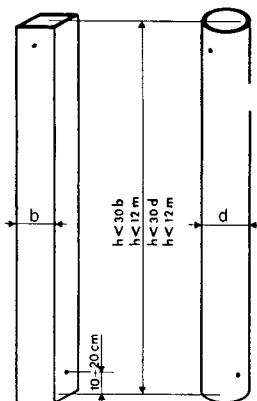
Length of concrete filled columns and arrangement of the vent holes
